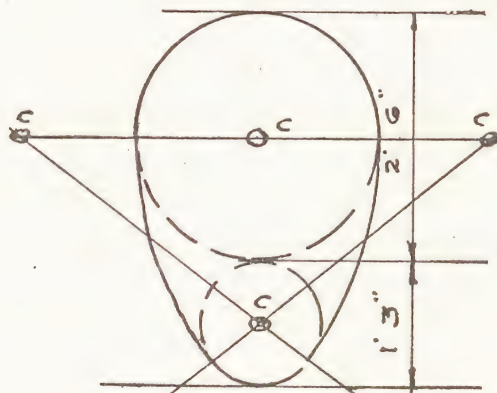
Alternative method of drawing section of egg-shaped sewer.
